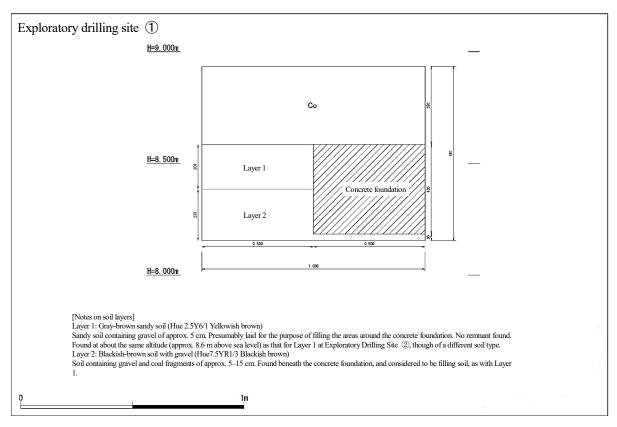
Exploratory Drilling Site ①, diagram of soil layers in Northern wall
